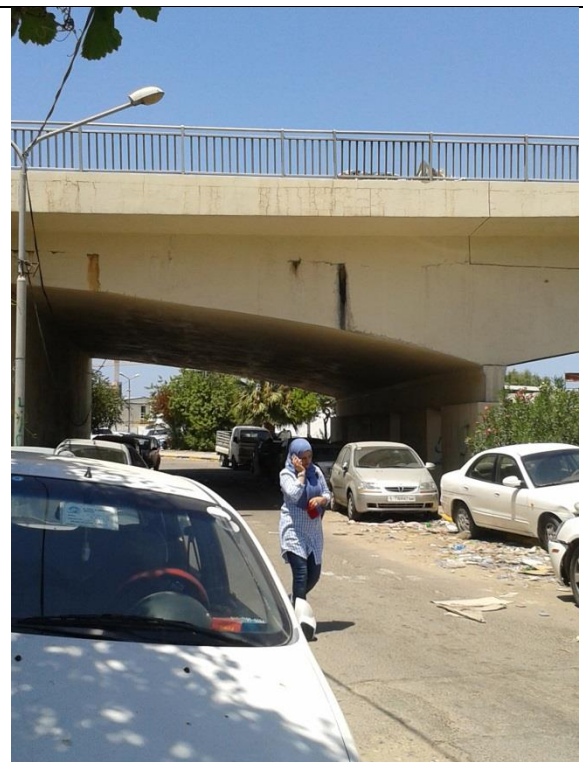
A general view of Bab Bin Gheshir road bridge, side part, east
